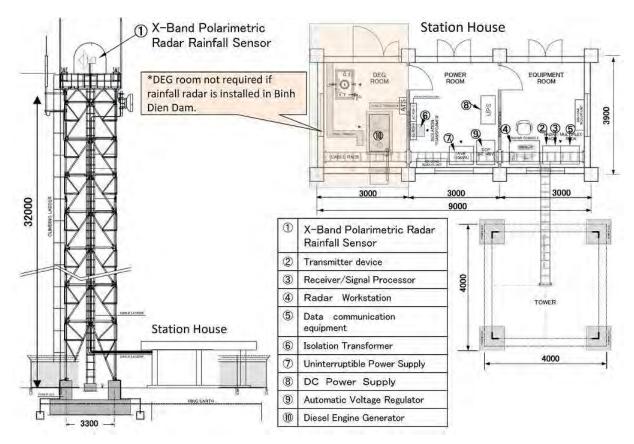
Rainfall Radar Installation Overview Diagram (details stated in Outline Design Drawing)
